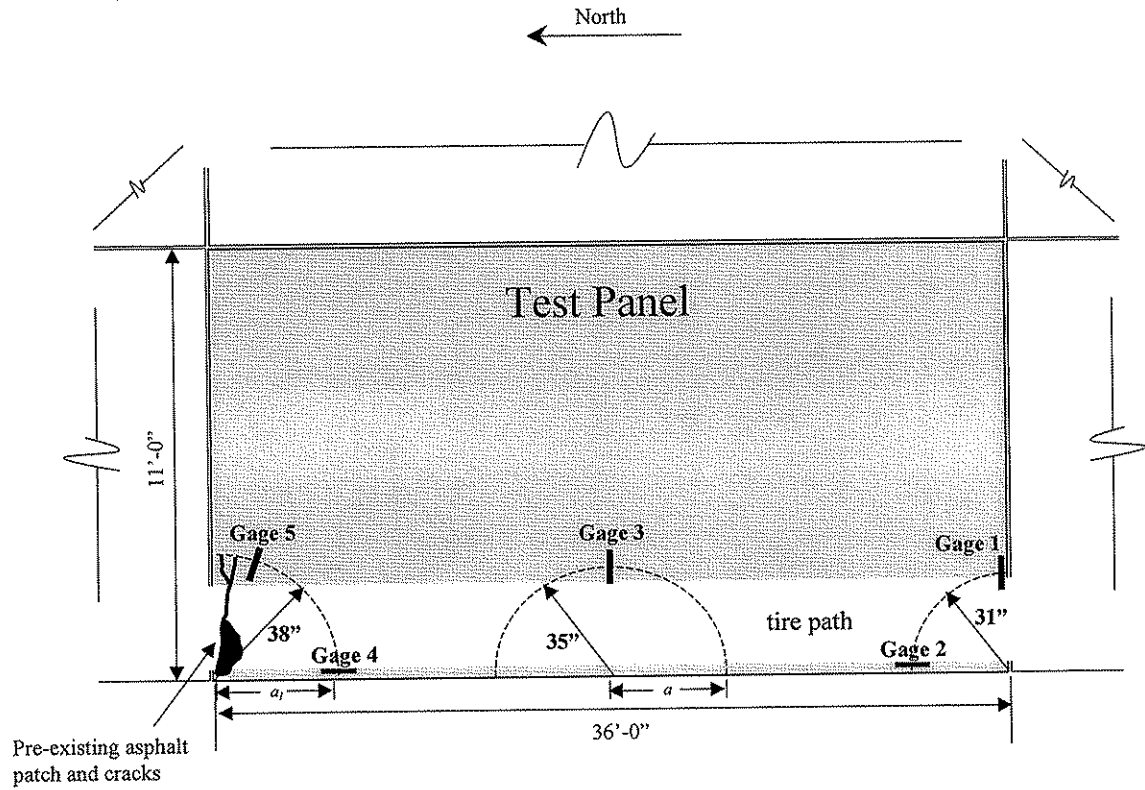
Strain gage layout and loading path on PCC pavement panel.
